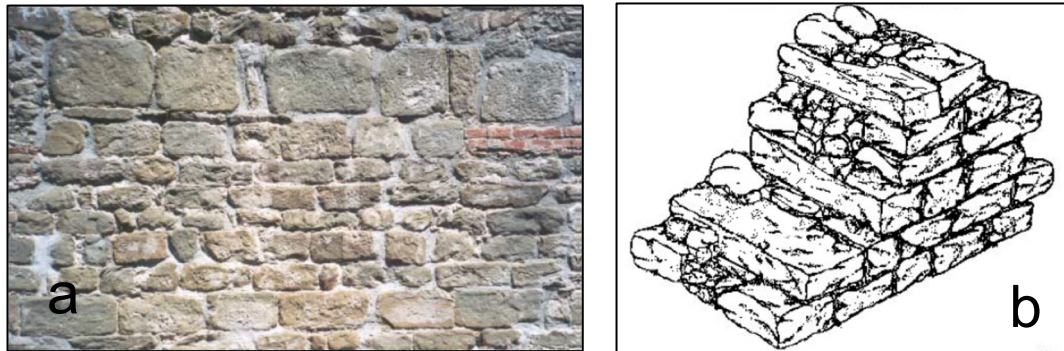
Example of the B type masonry assemblage from [19] abacus; (a) external assemblage; (b) inner assemblages.
